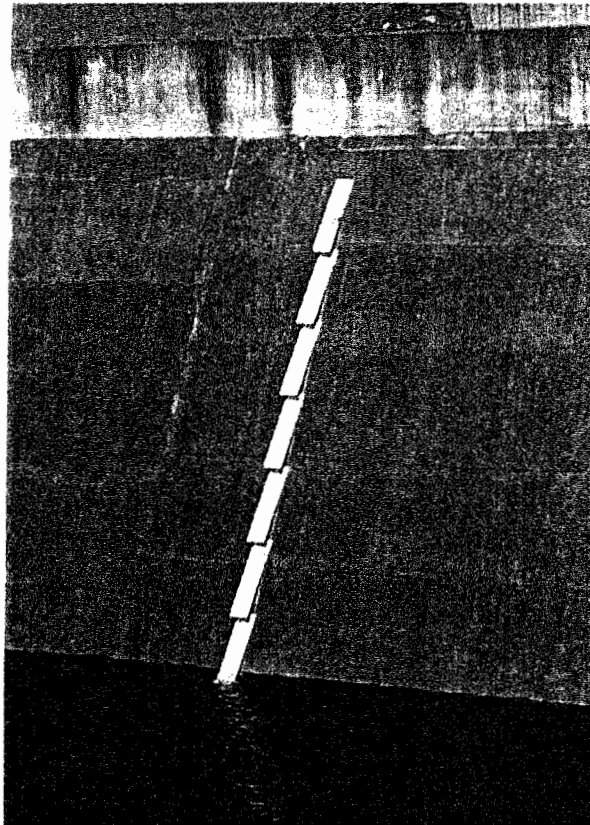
Existing Wivenhoe Dam Gauge Boards
